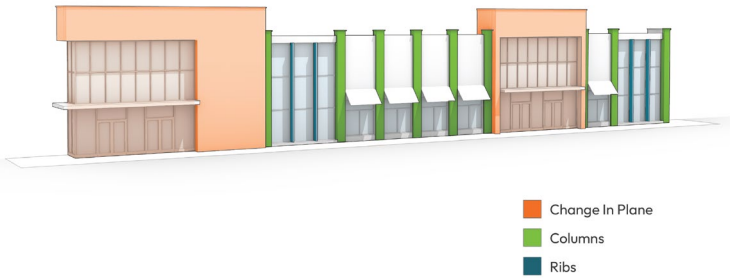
Front and Street Side Façade Articulation Requirements - Multitenant Building
